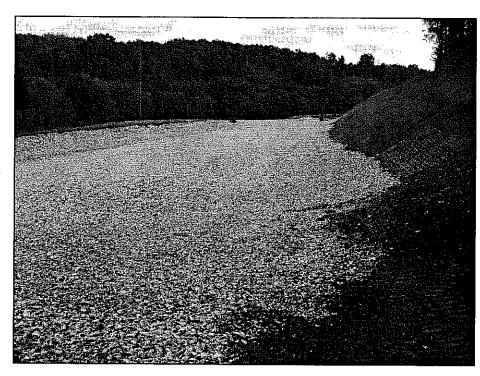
DOWNSTREAM VIEW FROM MINE SEAL OF LIMESTONE POND AND INLINE STRUCTURES
